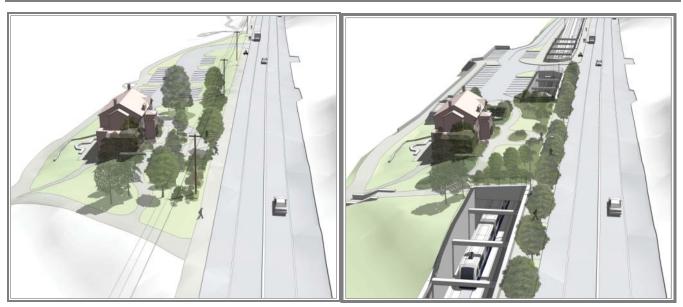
Winters House Bird's Eye View, Existing (left) and *Preferred Alternative B2M* (right)
